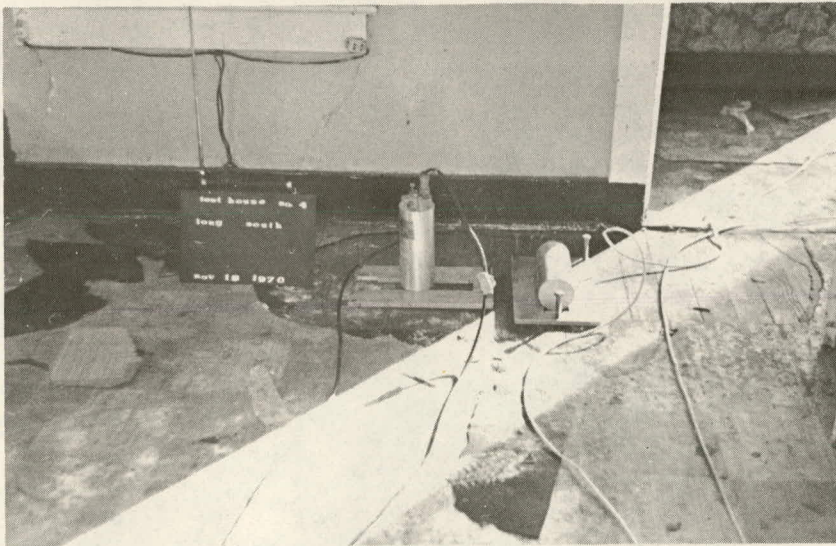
Station #4, Test House #4, seismometer location, south side of house.
